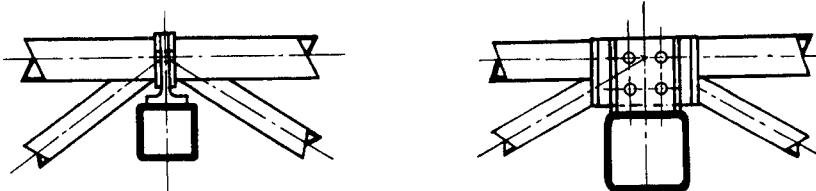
Detail 1 (length adjustment restricted to the bolt hole tolerances)
